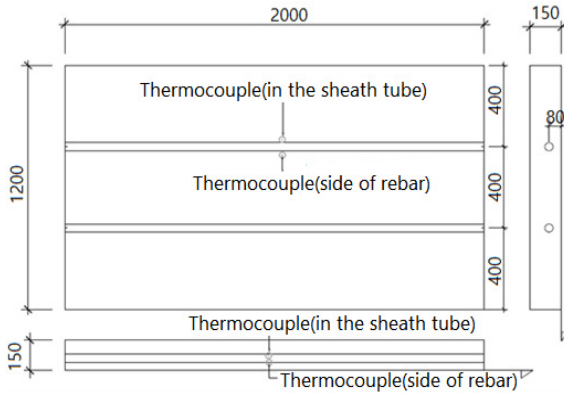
Slab specimen (arrangement of tendon and thermocouples)
